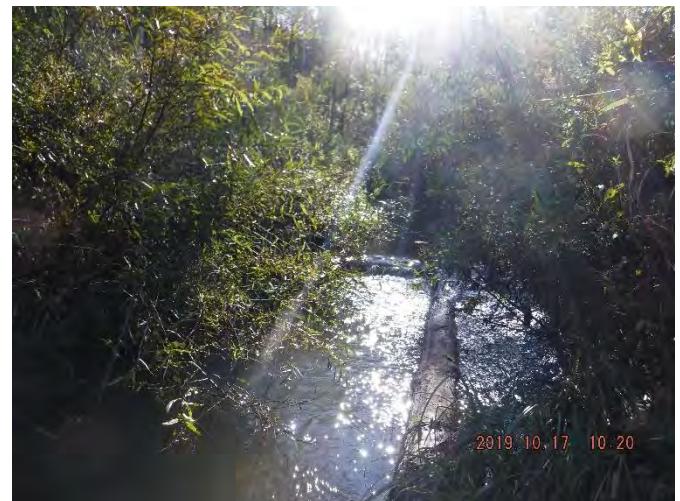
Mainstem Photo Point 1 – Station 29+26
